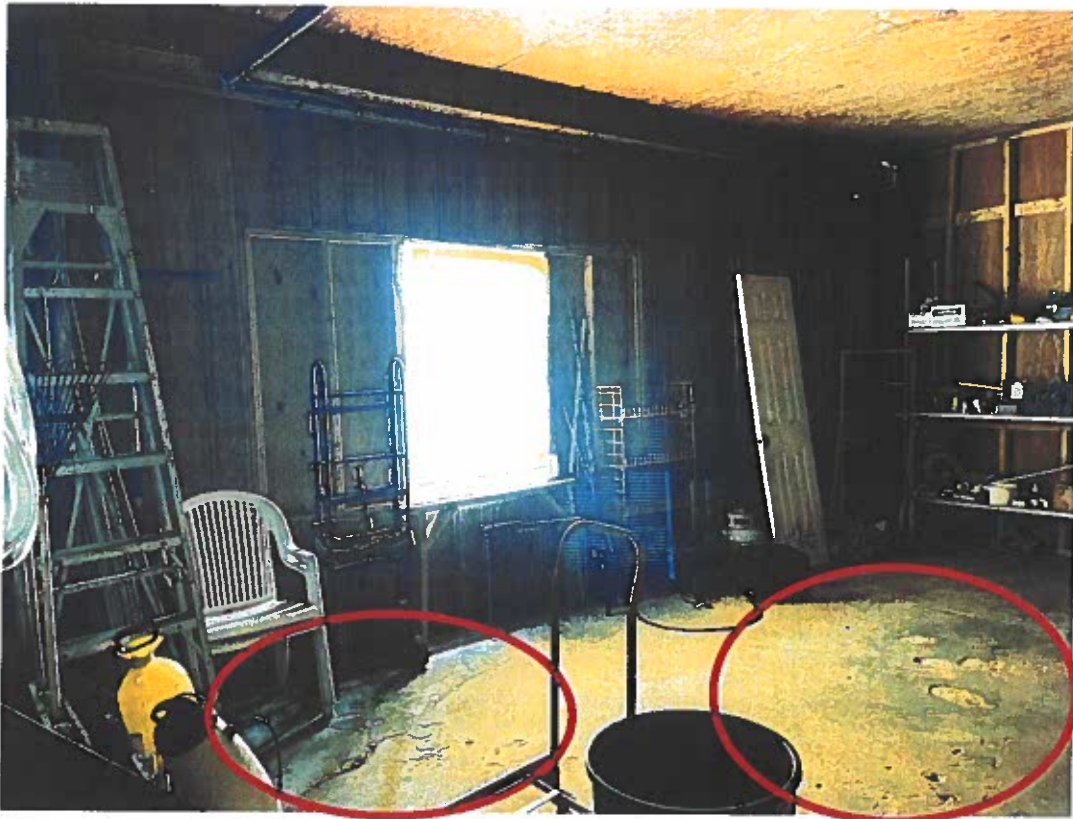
Cracks and damage to concrete slab on grade.
